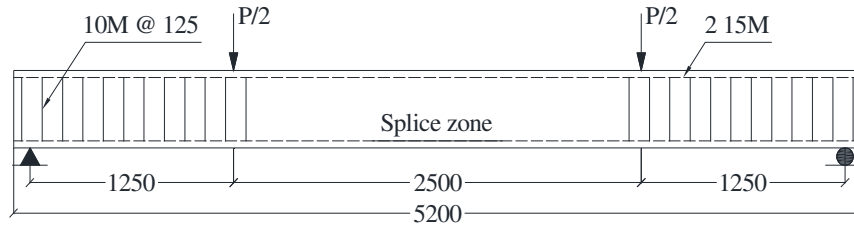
Details of the geometry and transverse reinforcement of the test beams
